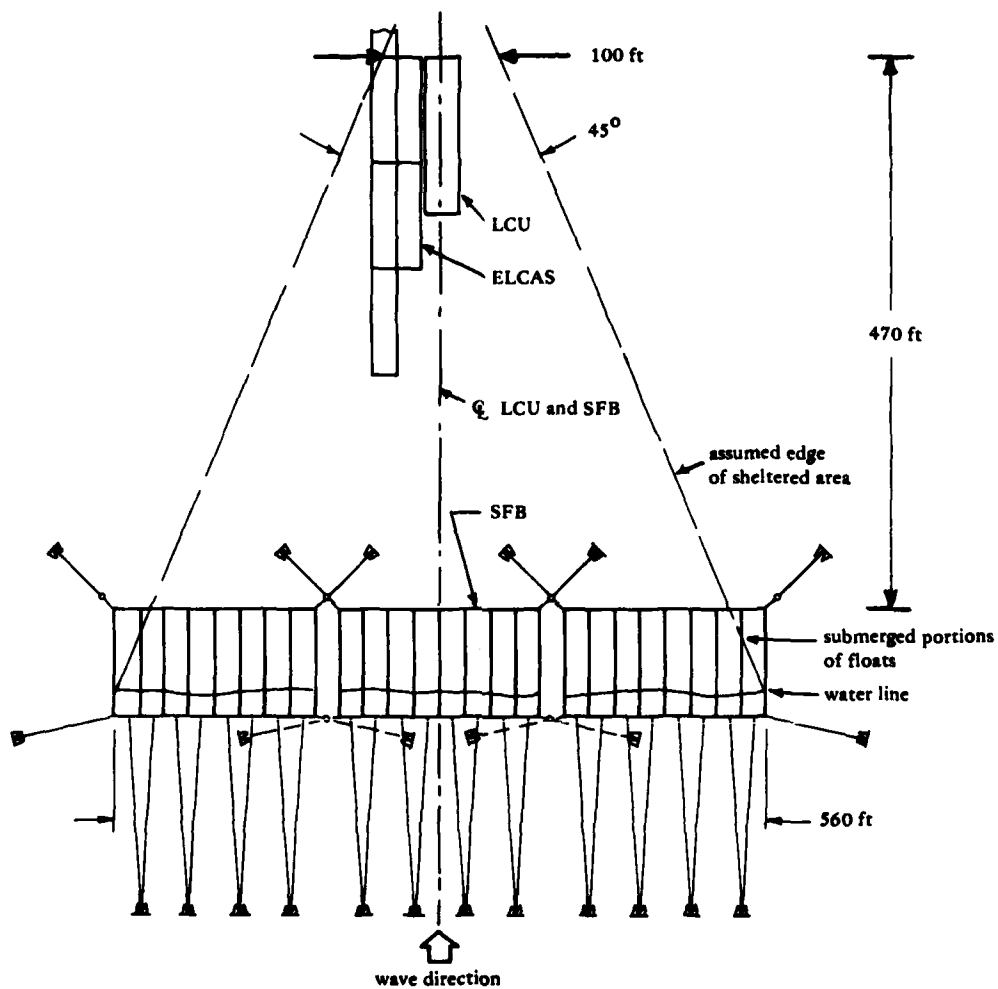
Tentative layout for a sloping float breakwater (SFB) composed of 3x15 NL pontoon sections, with application to the elevated causeway system (ELCAS).
